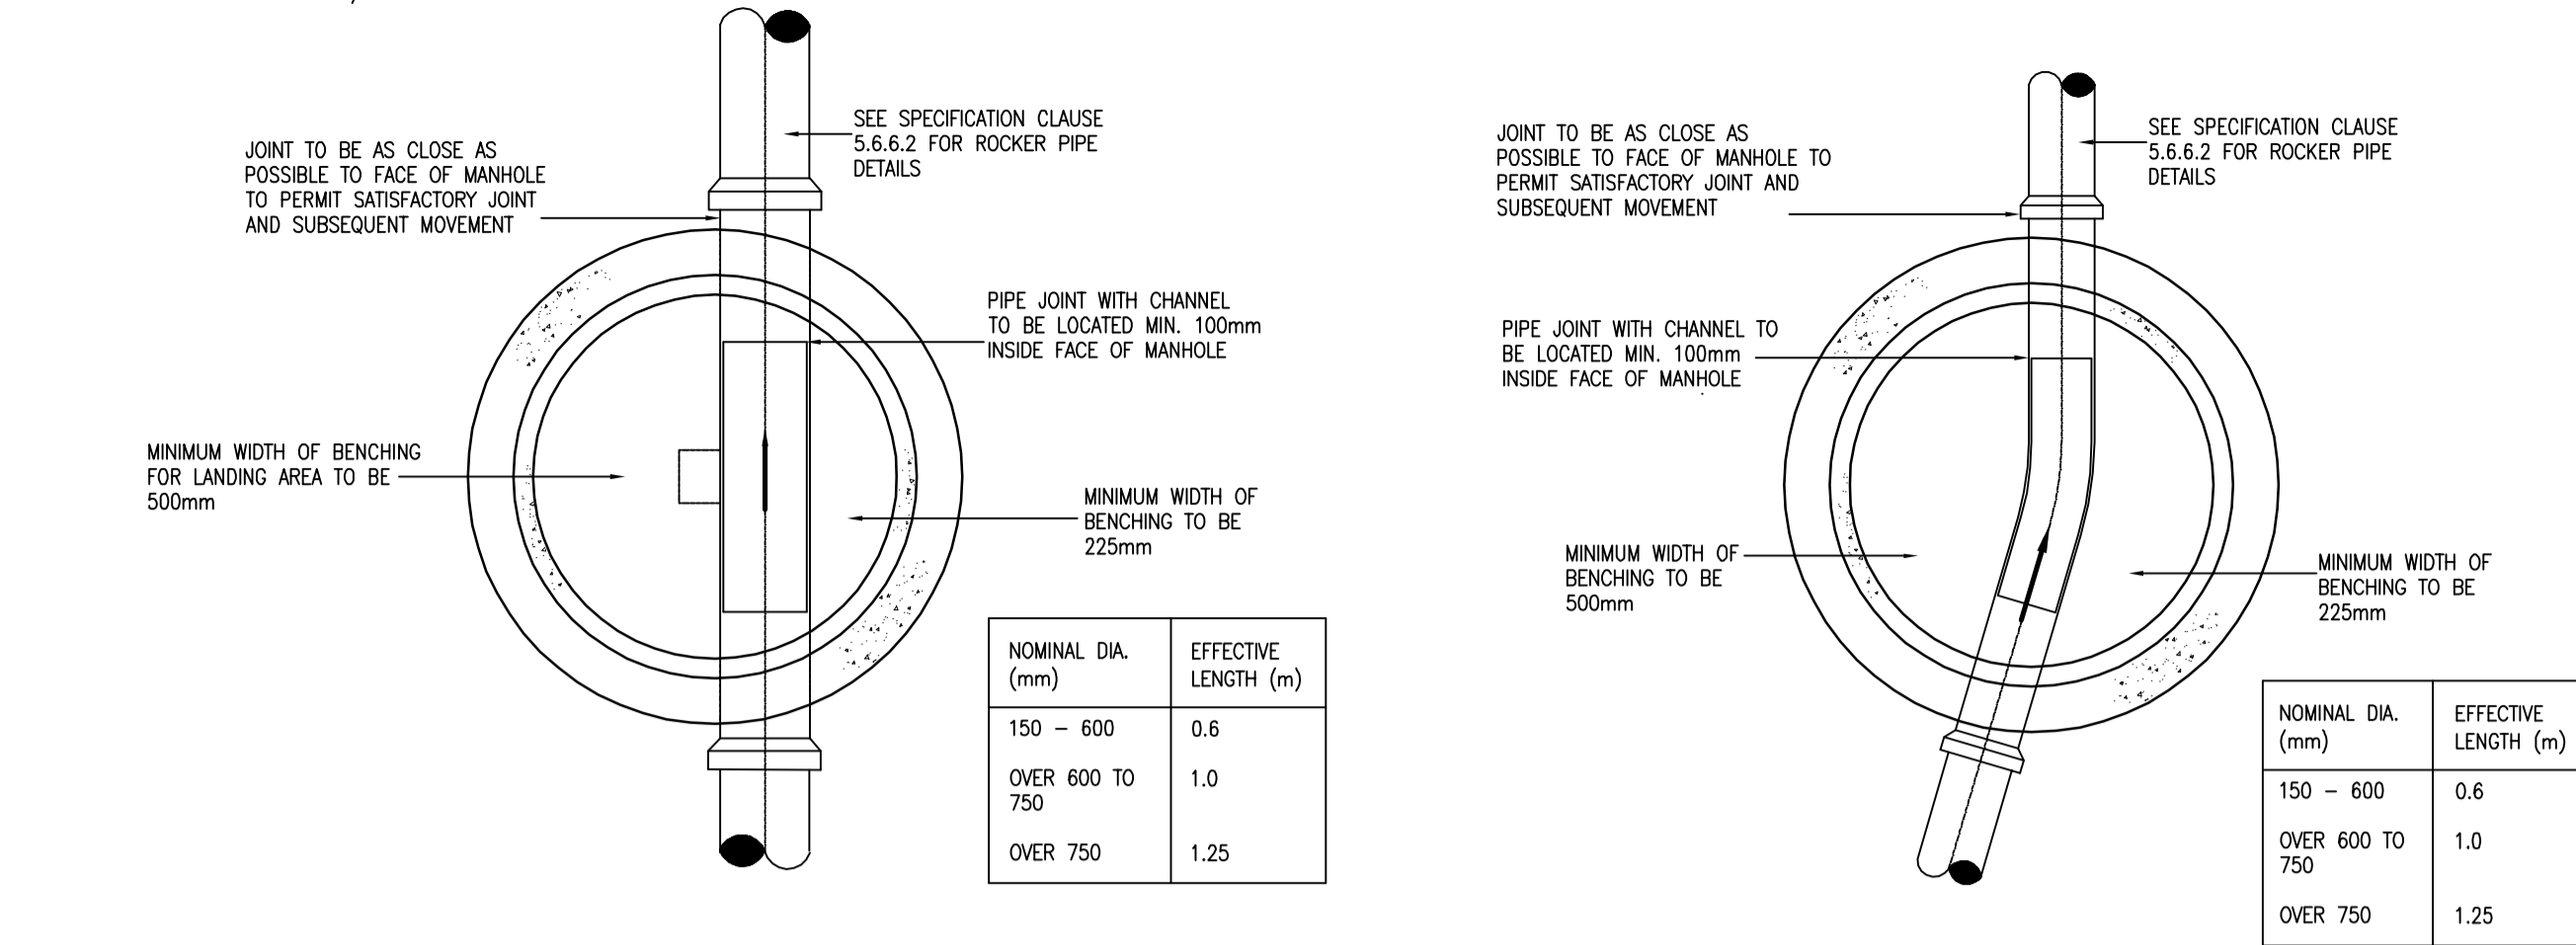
TYPICAL MANHOLE DETAIL - TYPE A
